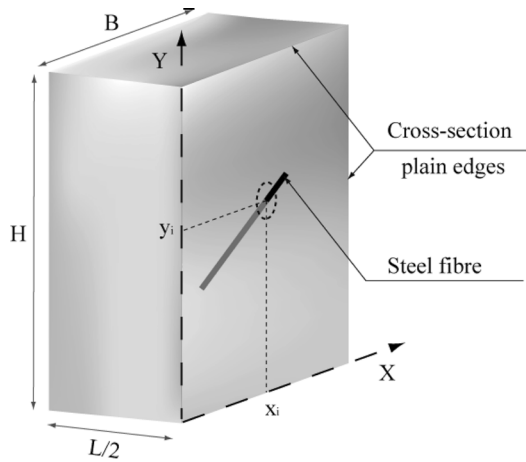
Steel fibre cut-through point on the cross-section surface of composite space
